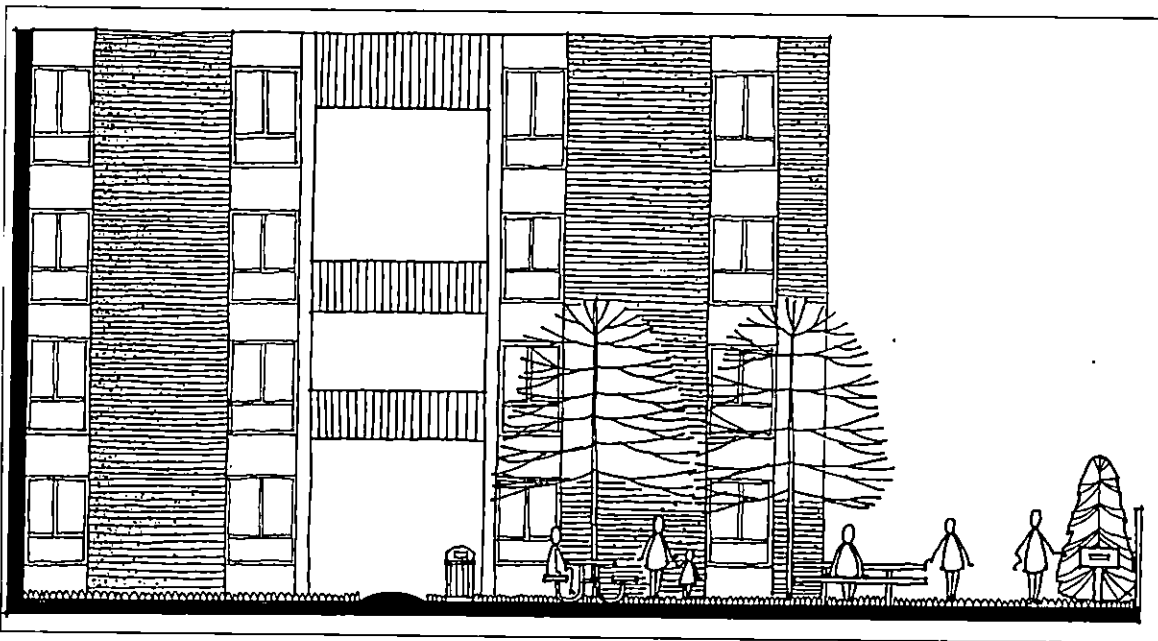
View of playground — Foxglenn Apartments (Area B on Plan 2).
